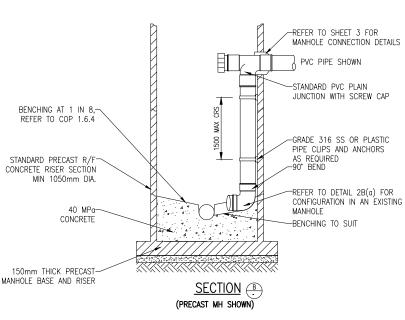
C SEWER & STORMWATER MANHOLE FOR > DN 750
